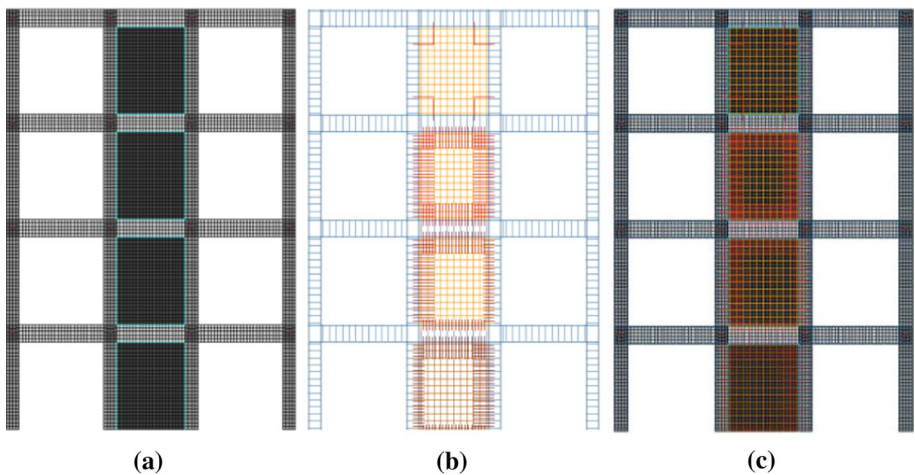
a RC frame with 2D line interface elements at the interfaces and plane stress elements, b Embedded reinforcement bars for the existing frame and web reinforcements and dowel elements which can take shear forces, c Complete FE model II (DIANA FEA BV 2019)
